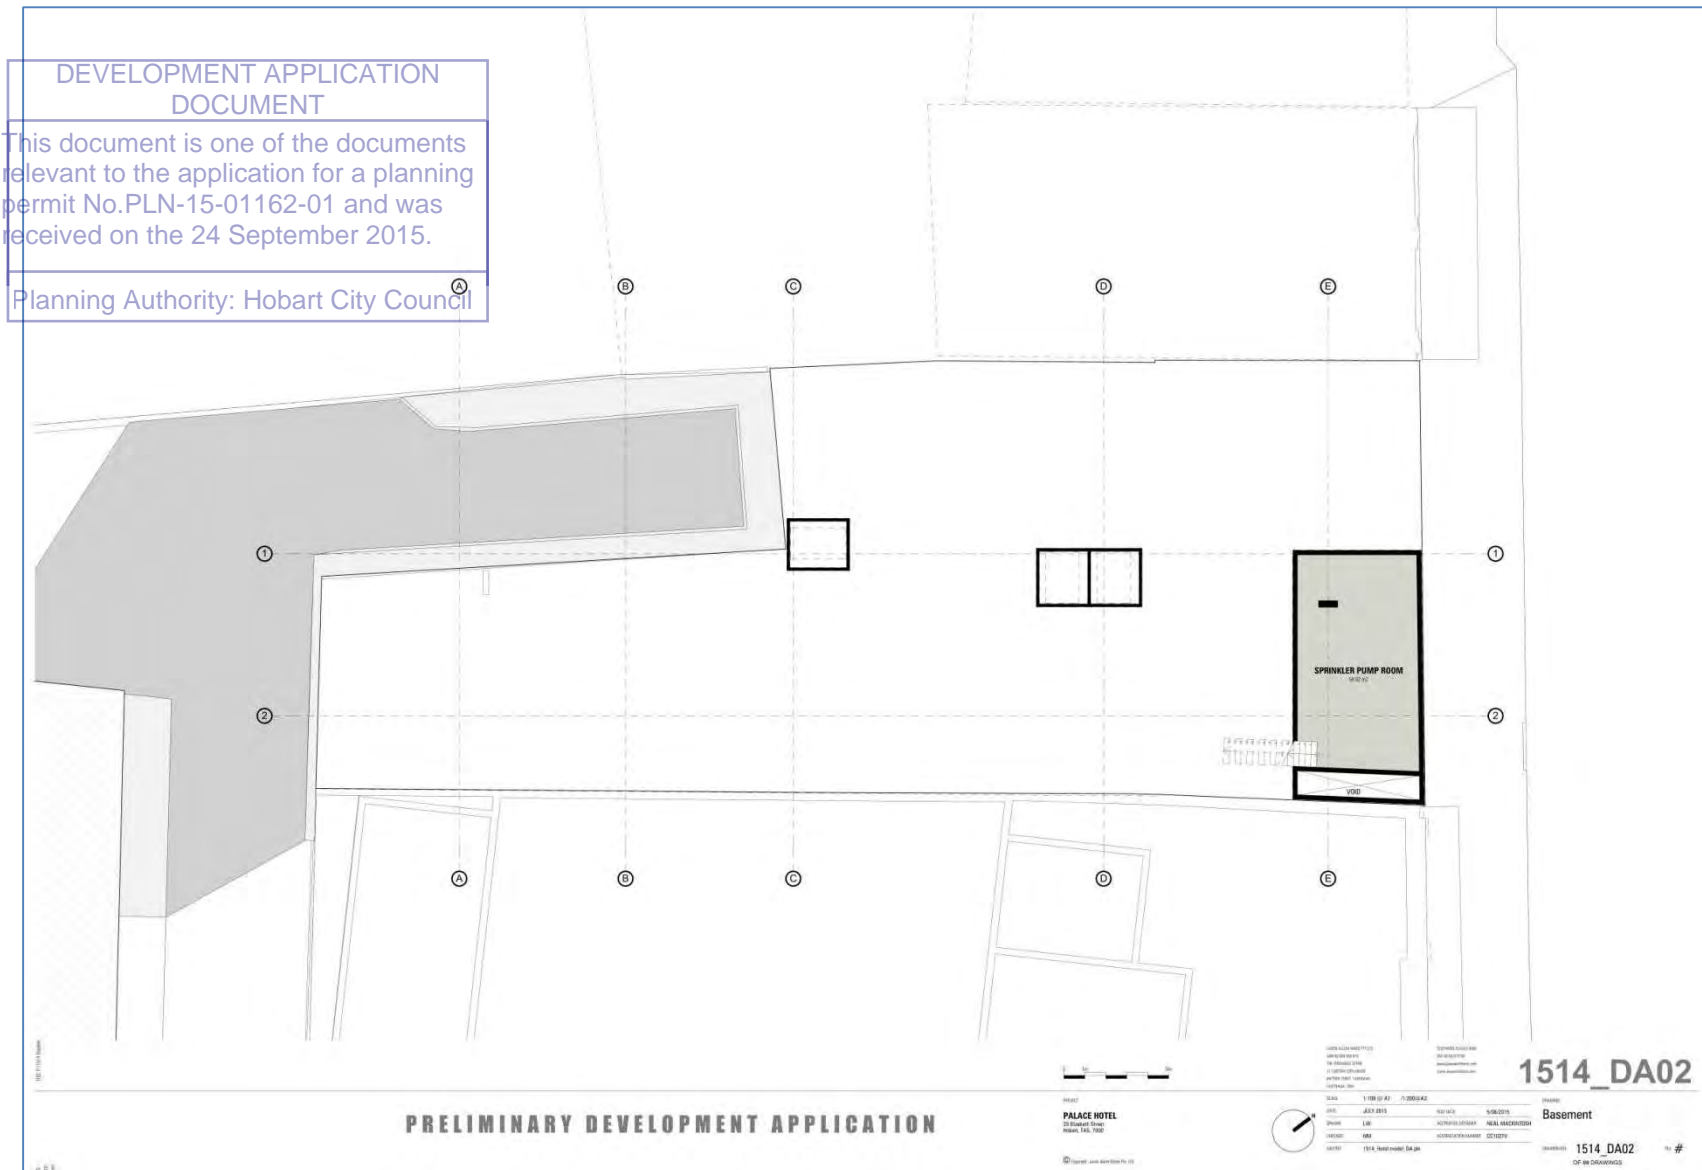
Location of Basement on Elizabeth Street frontage (Jaws Architects).
